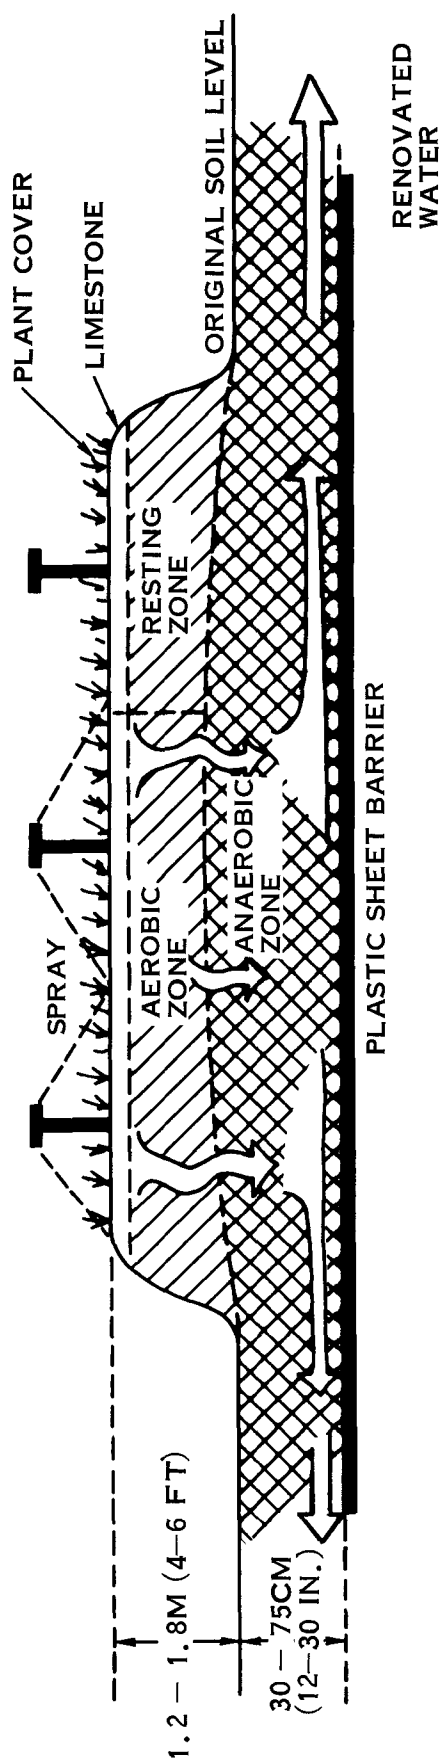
BARRIERED LANDSCAPE WATER RENOVATION SYSTEM
